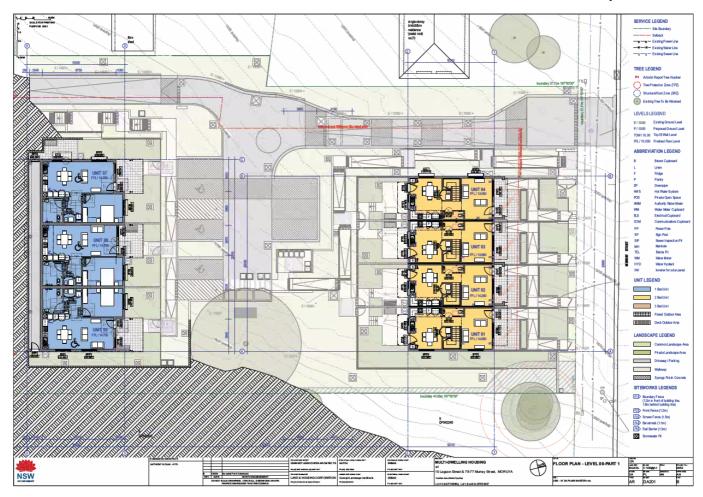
Extract from Architectural Plans – Floor Plan – Ground Level (Source: Architectural Plans, Kennedy Associates, dated 16/02/2024)
